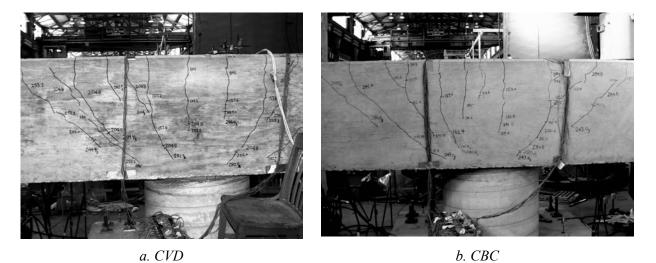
CVD3 and CBC3 Crack Patterns on South Sidewall at Factored-Level Load
